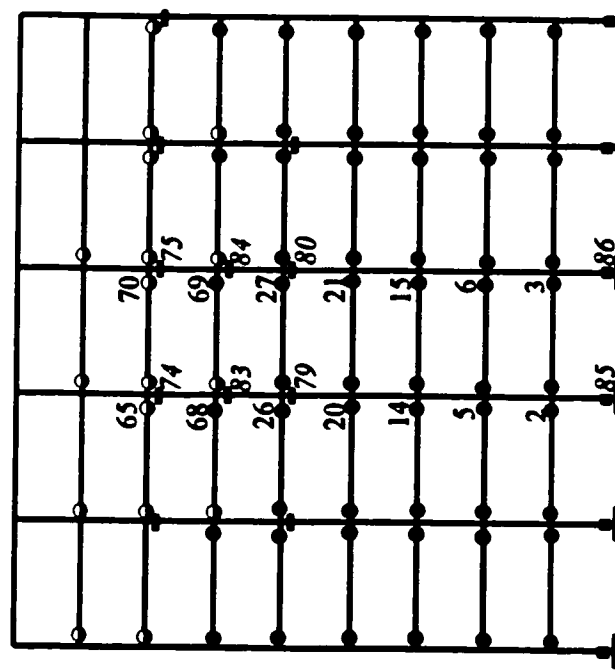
Hinge type and location of the existing 9-story frame due to the Long Beach earthquake (PGA = 0.24g)
